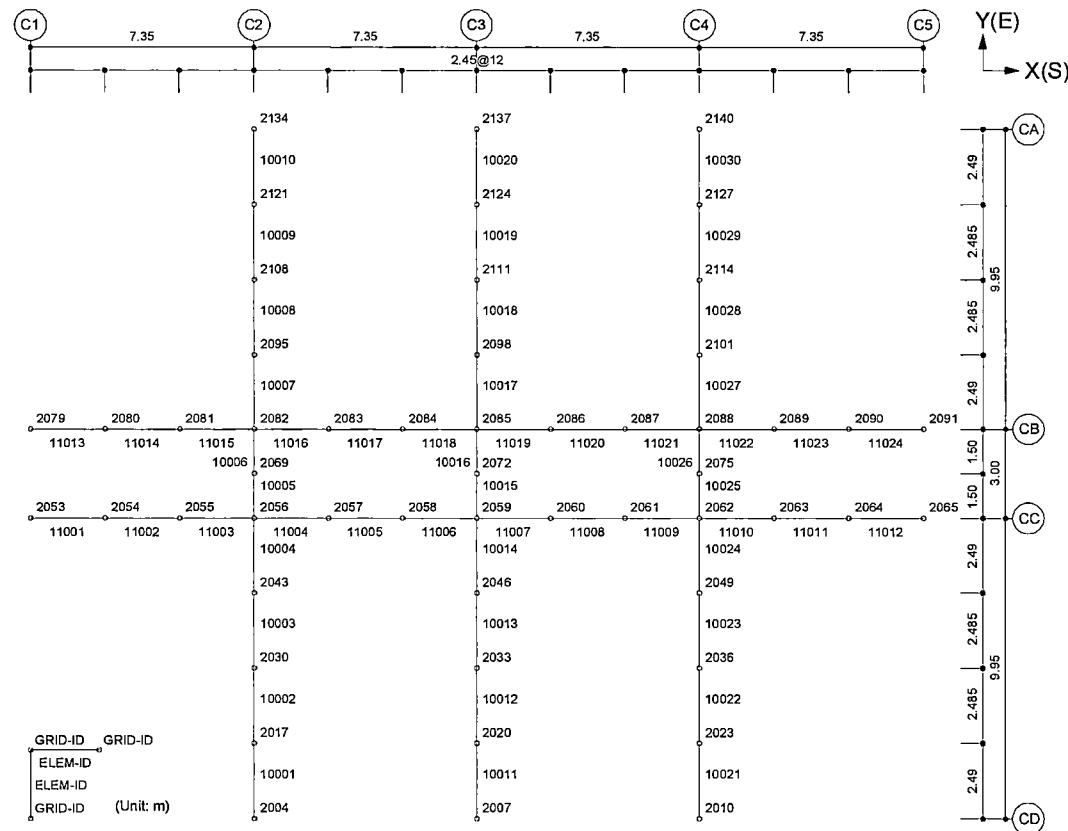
FE Model of Steel Plan, EL -2.00
